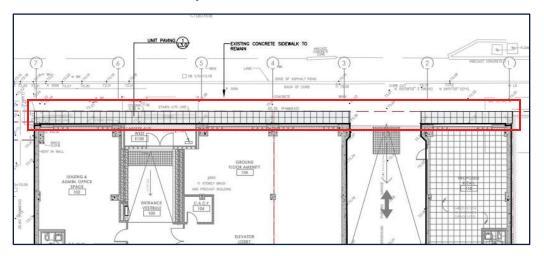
Snip of Landscape Plan Prepared by CSW Landscape Highlighting Unit Pavers on Ground Floor
